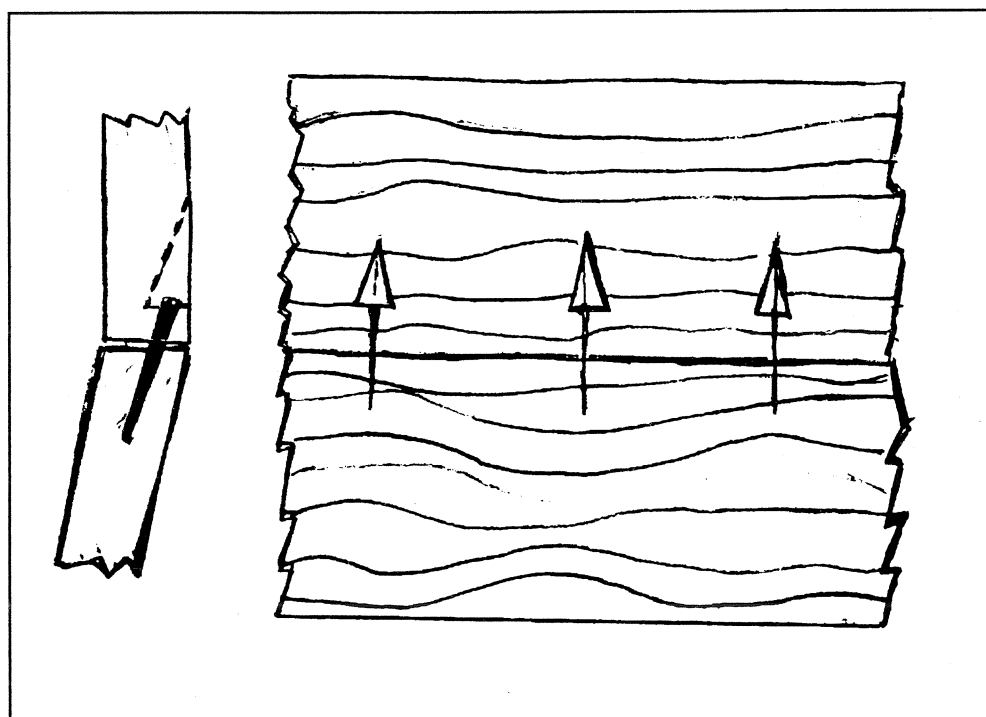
Sketch showing two views of triangular edge-nailing notches and angle of nail penetration across seam between planks.
